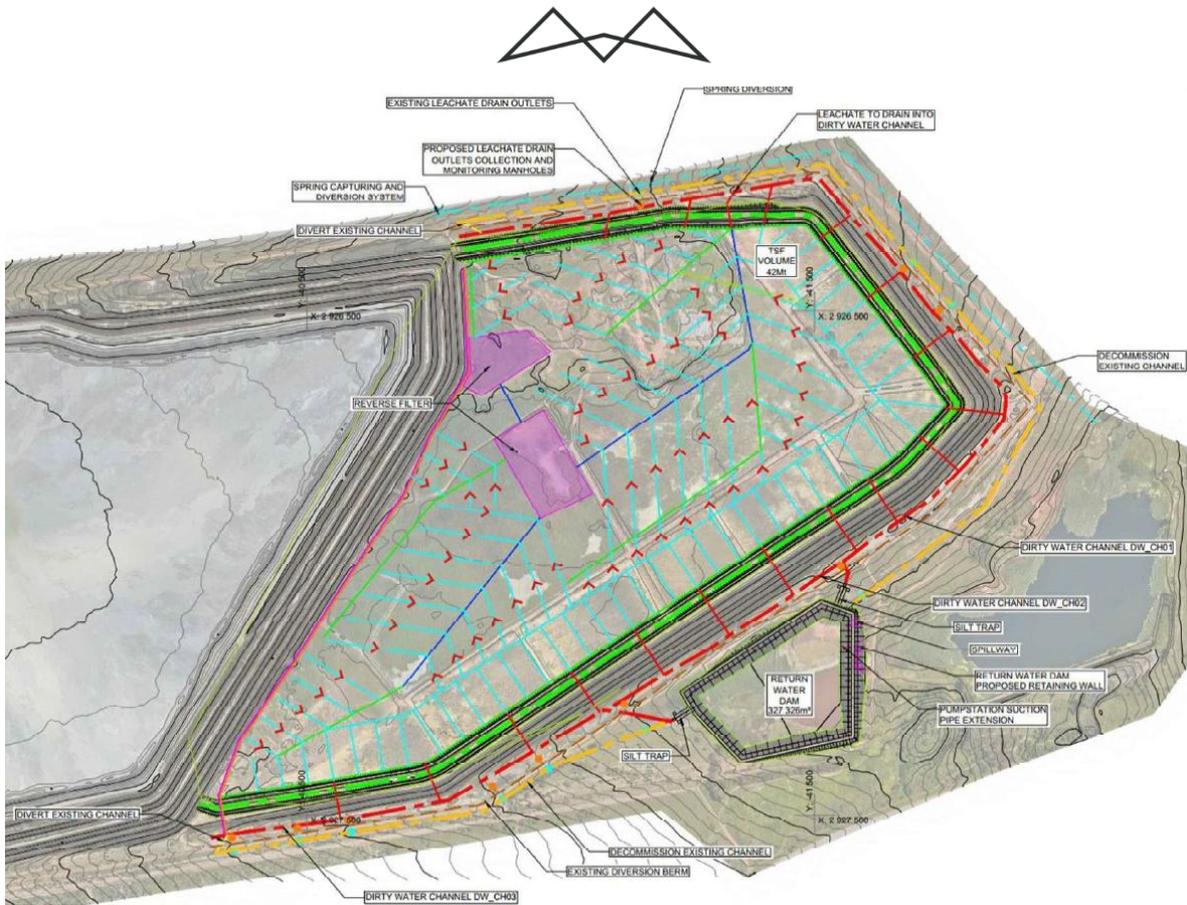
Potential stormwater and leachate collection system (Eco Elementum, 2025)
